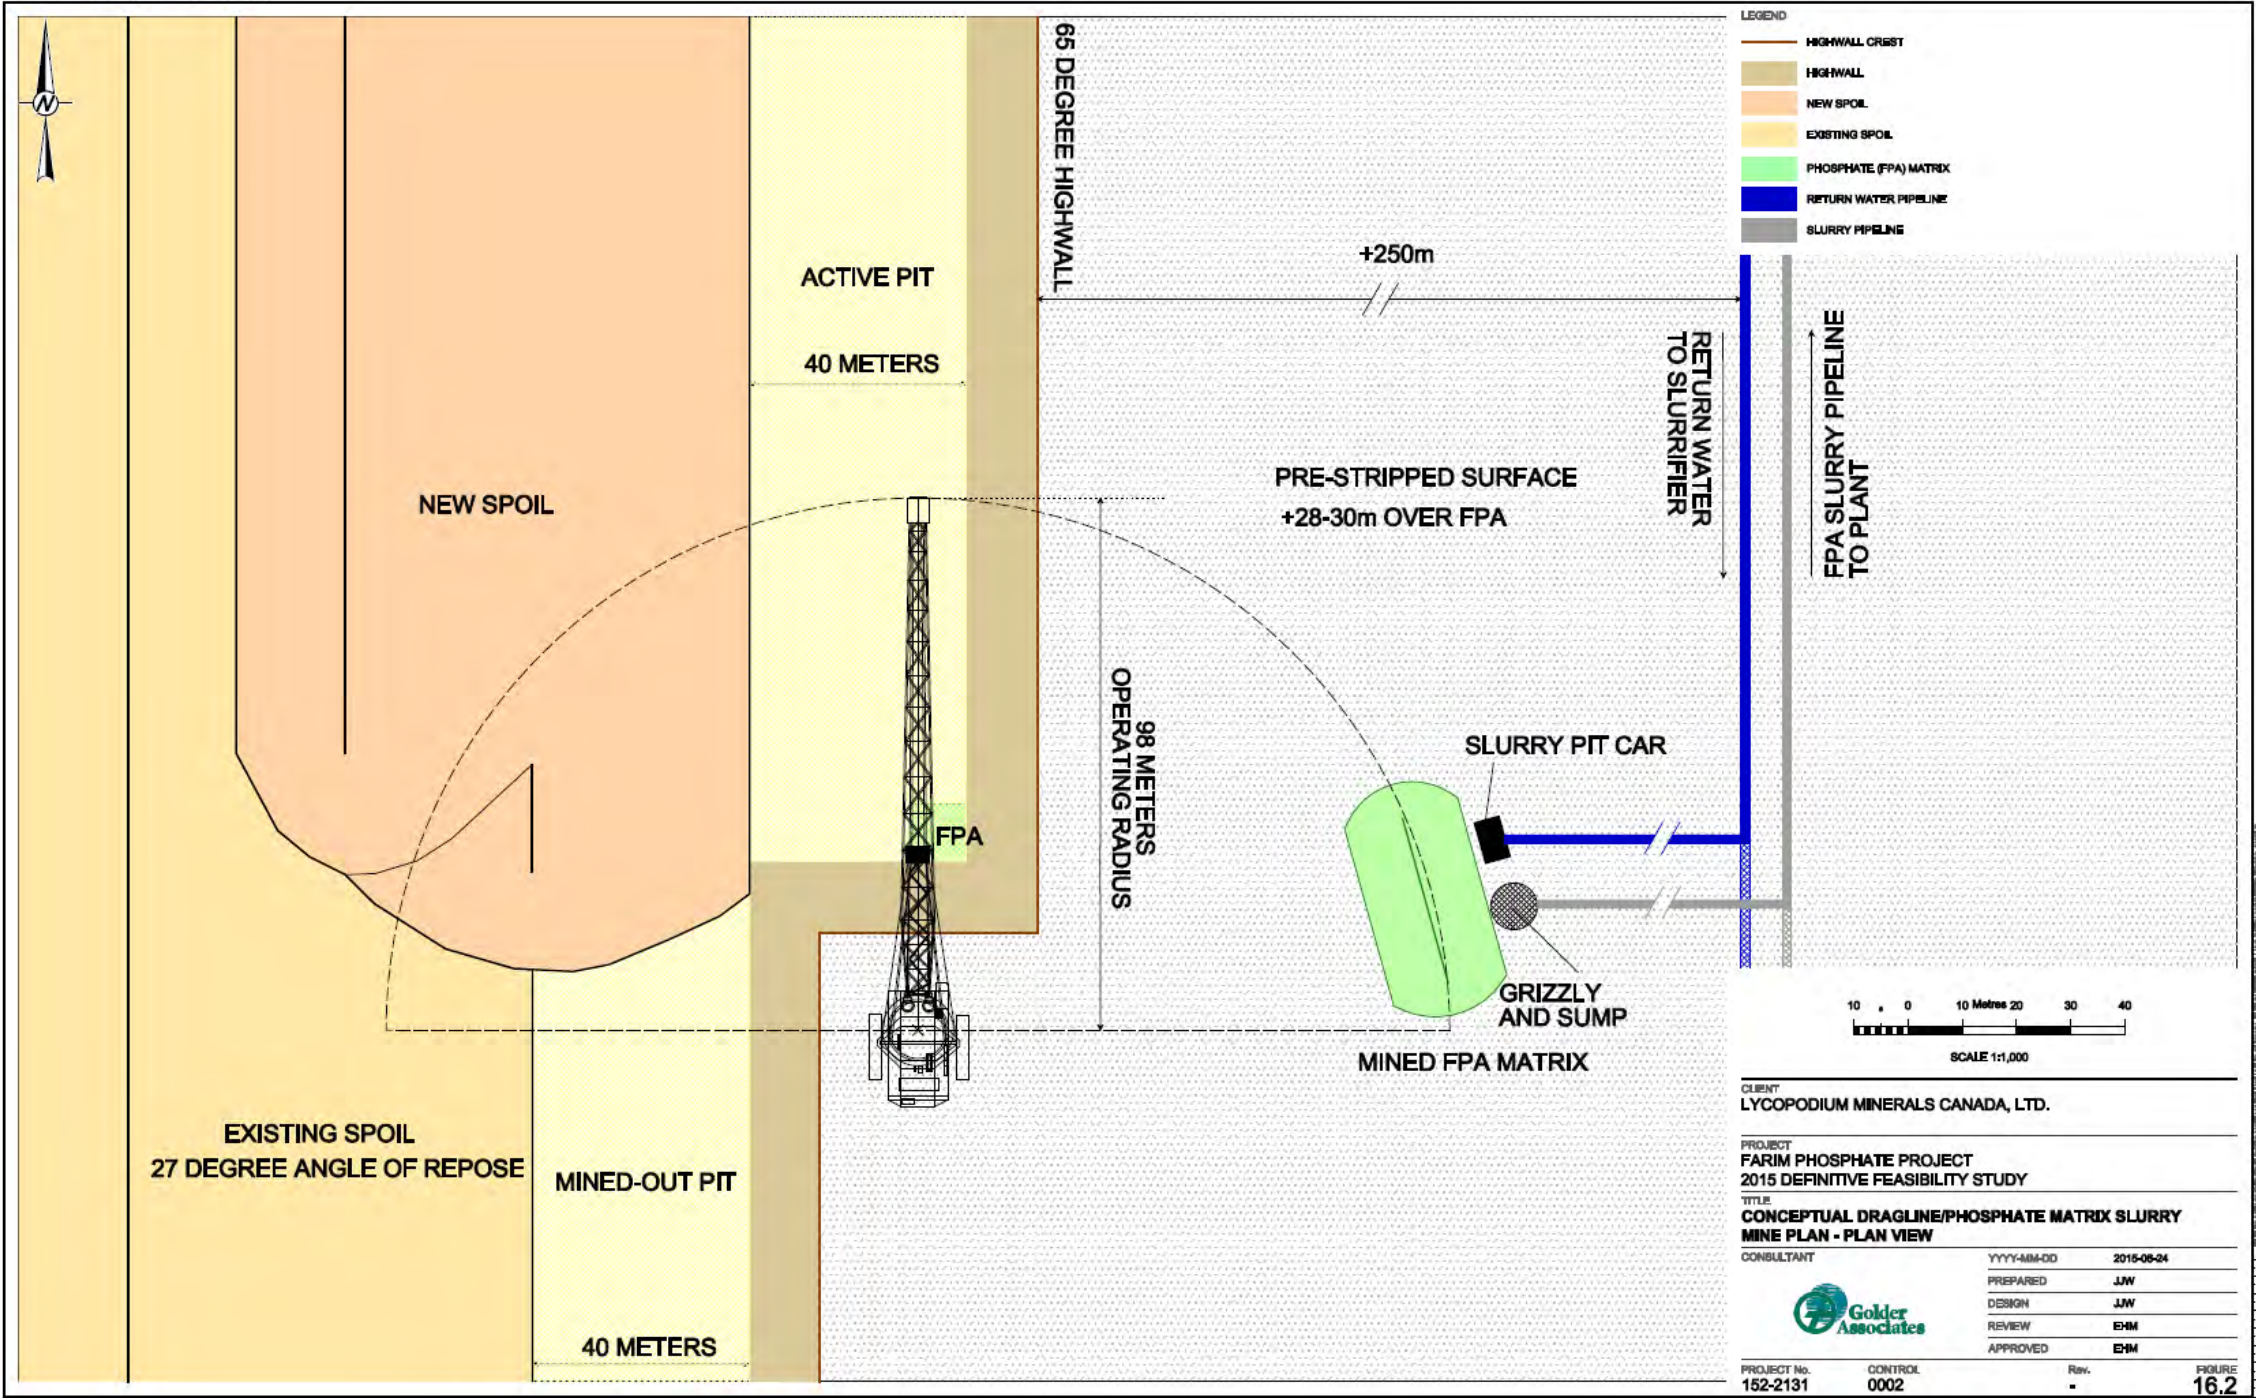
Conceptual Dragline/Phosphate Matrix Slurry Mine Plan – Plan View
